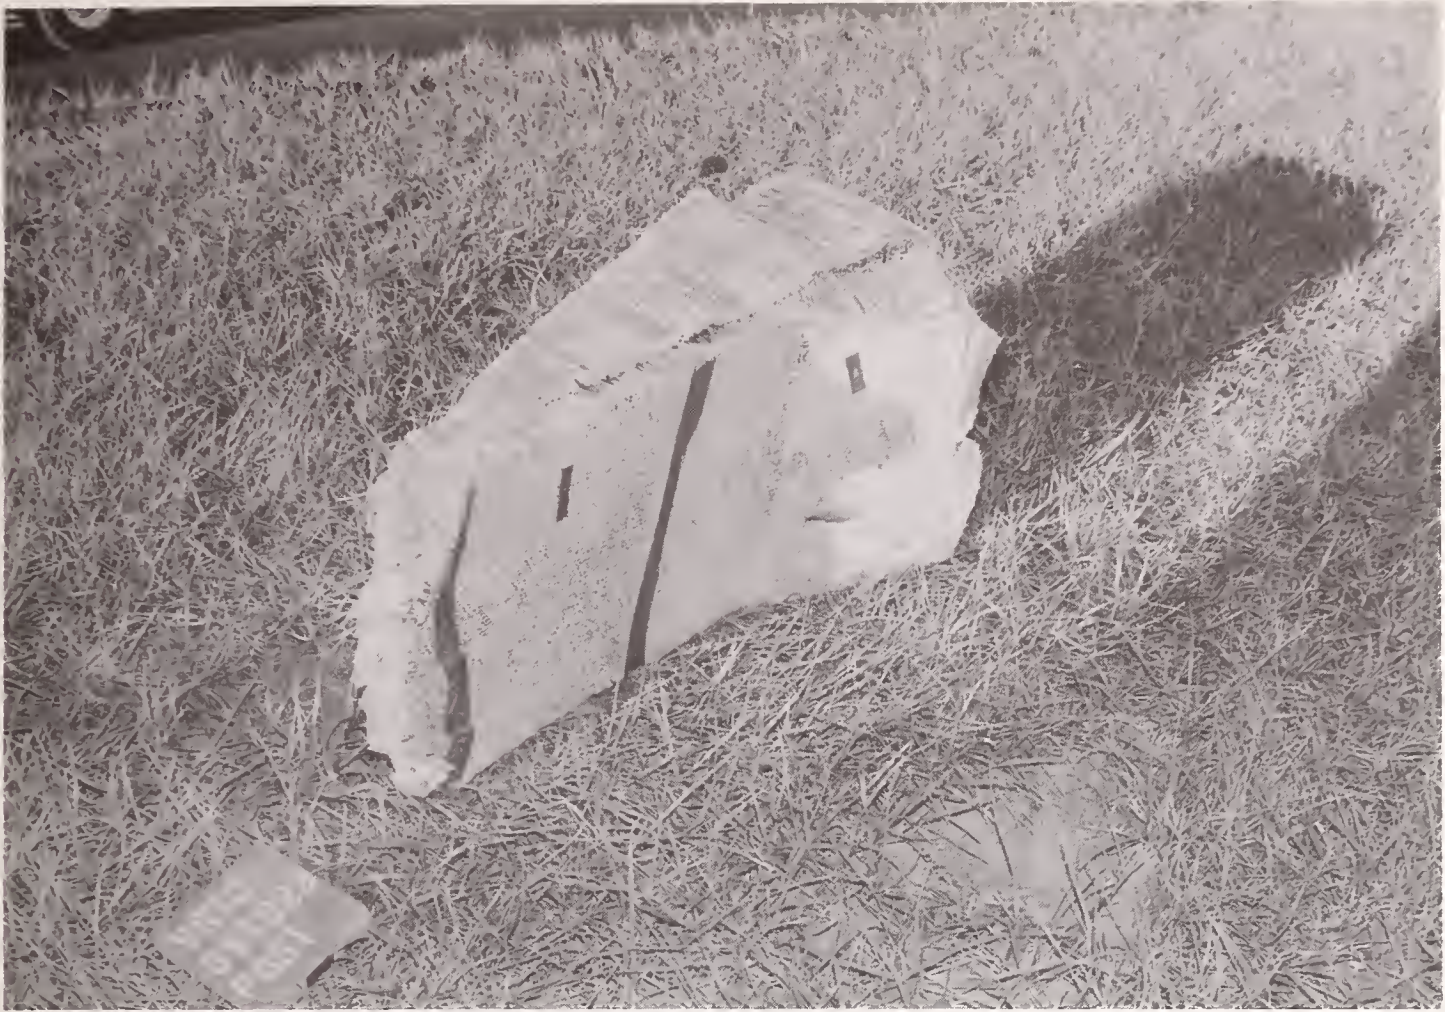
Post-Test Heavy Truck Bumper Hexcel View
